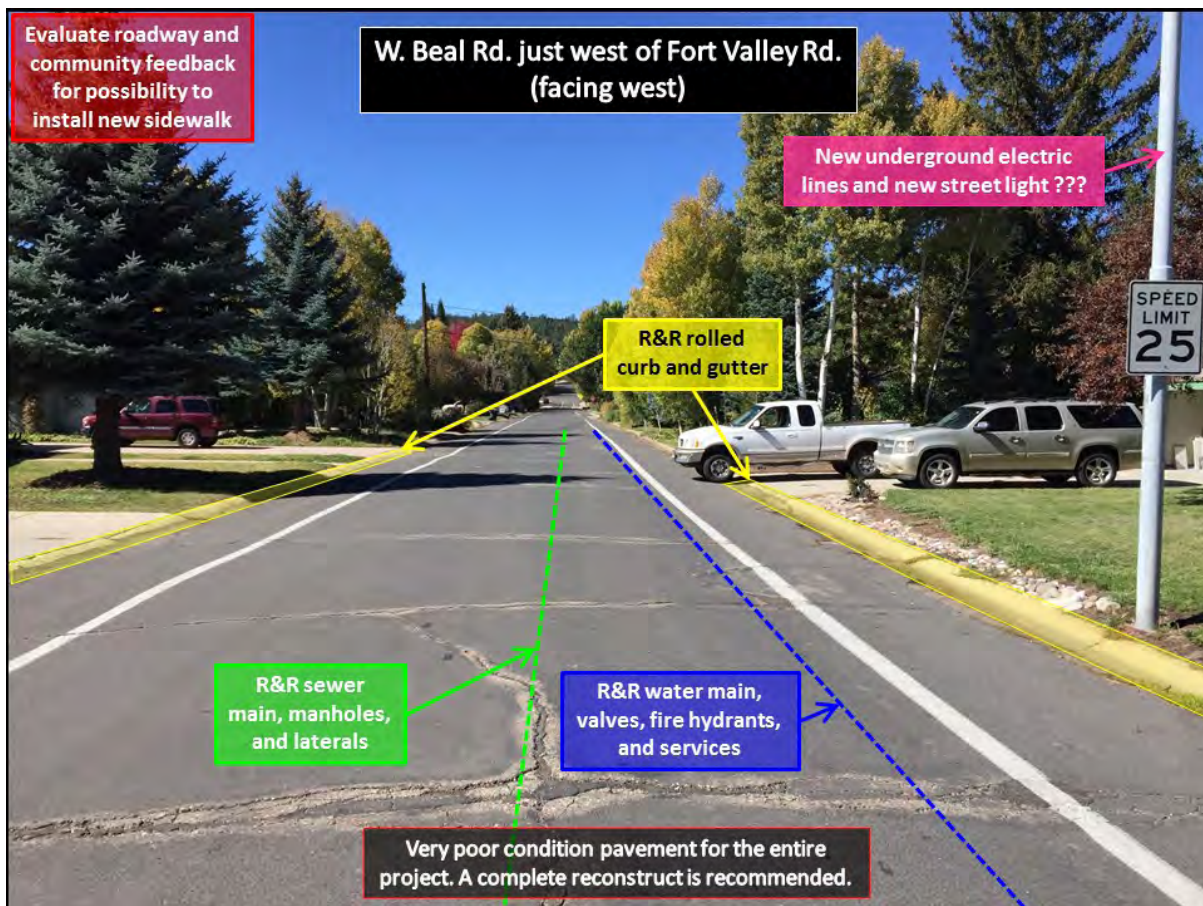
R&R water/sewer mains & appurtenances, pavement section, rolled curb and gutter, and street light??? .
